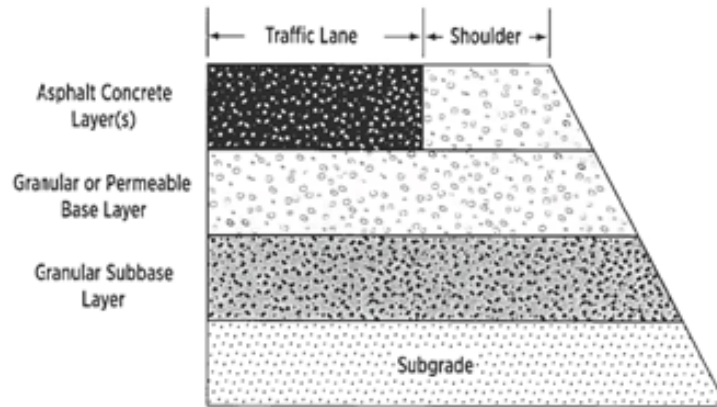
Typical cross section of a rural conventional asphalt concrete pavement [234]
